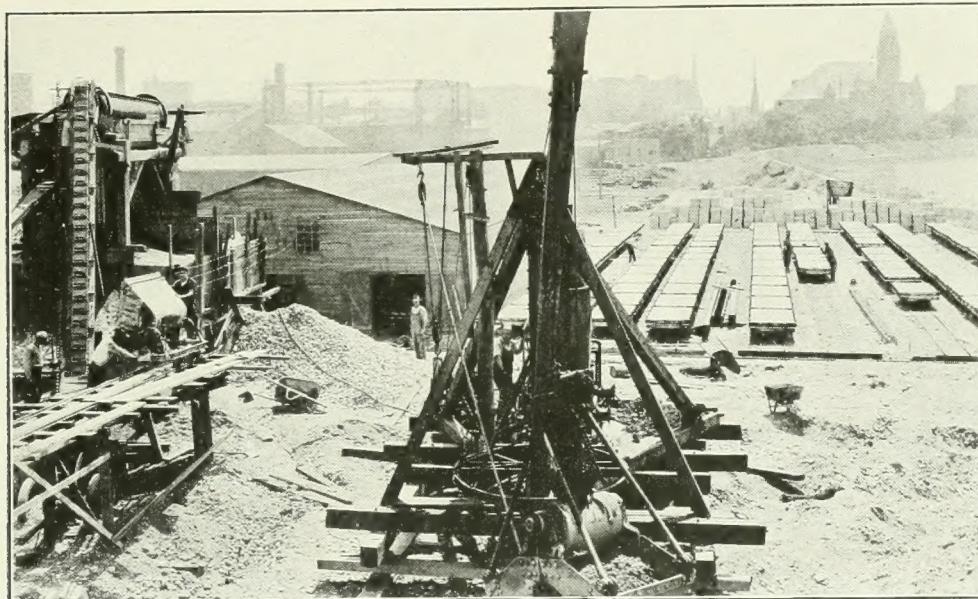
PRICE BROS. CONCRETE BLOCK PLANT
